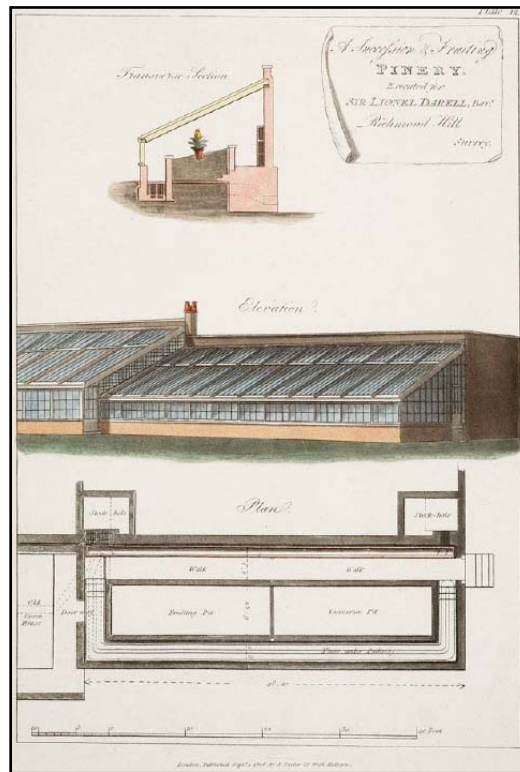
Plan and elevations of the Pinery at Richmond (Taylor J, 1823)
